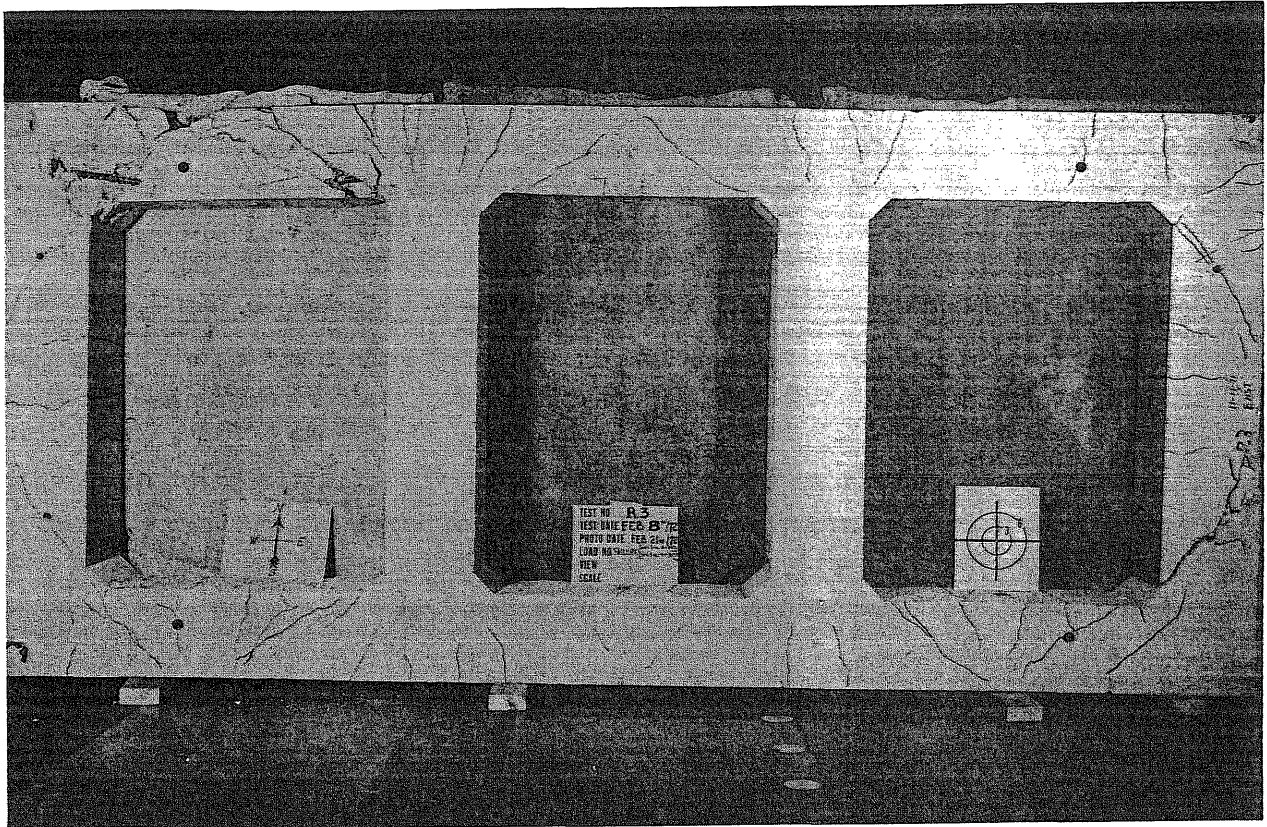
SPECIMEN R3 AFTER TESTS TO FAILURE
